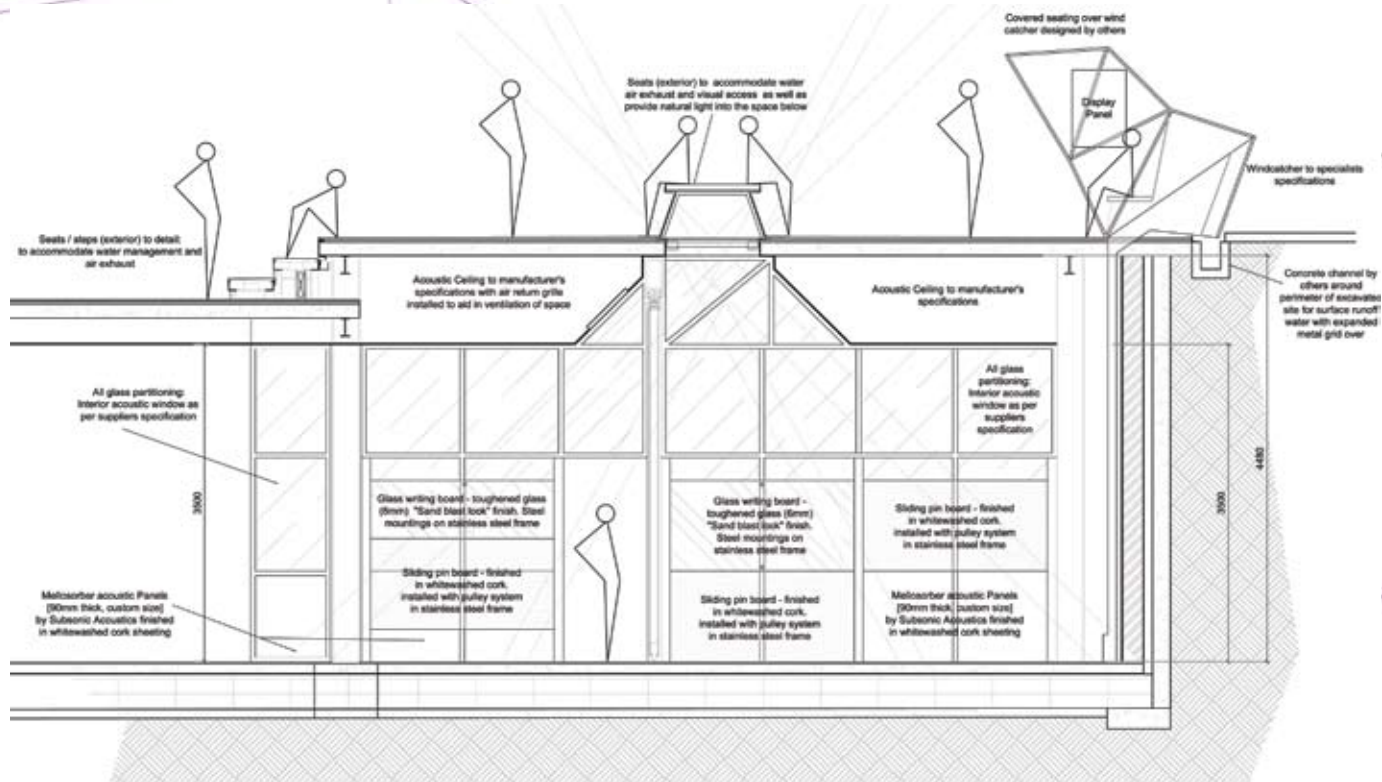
Elevation of wall detail in Pnyx Meeting Rooms
